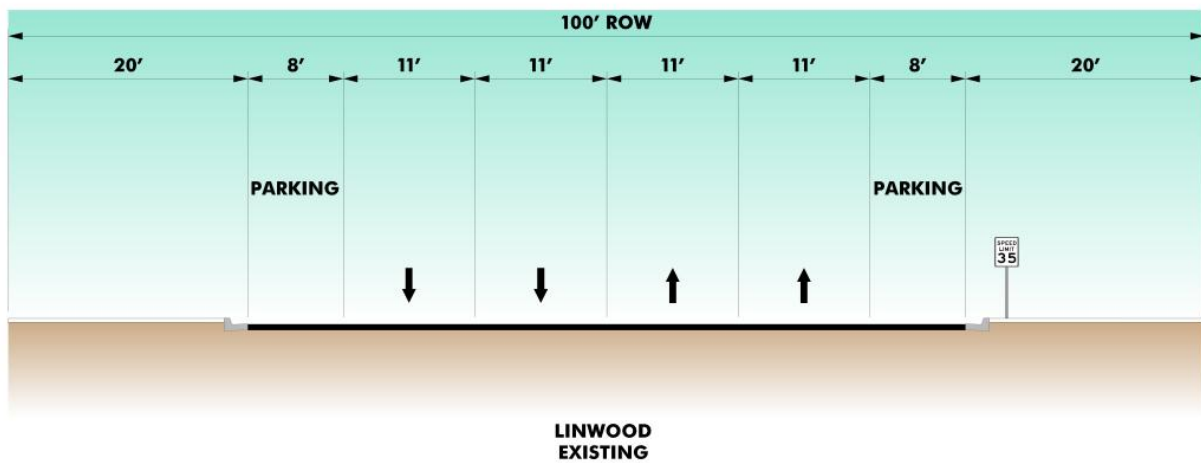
Enhanced Streetcar Linwood Blvd Typical Section, Existing Conditions
